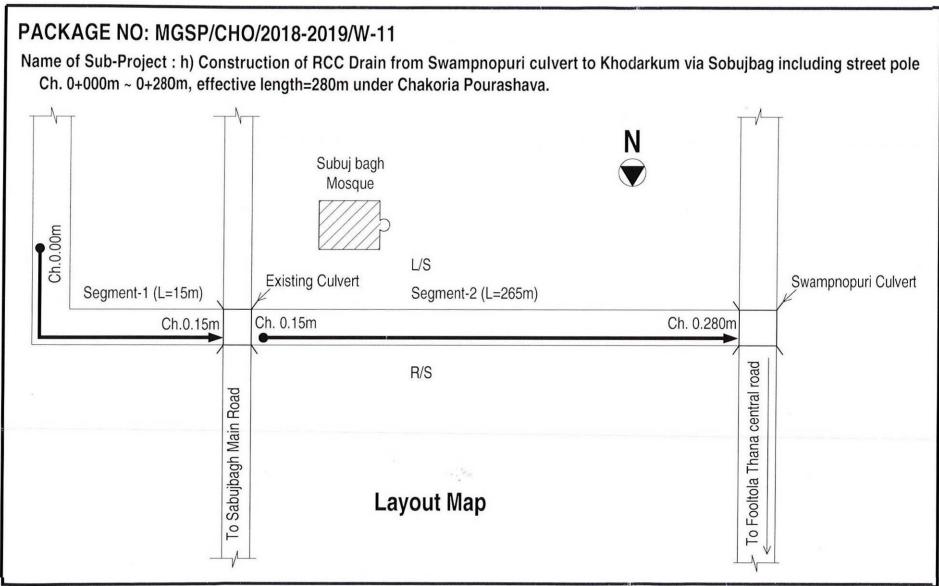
(h): Layout Plan of the proposed Subproject area from Shawnapuri culvert to Khodarkum via Sobujbag
